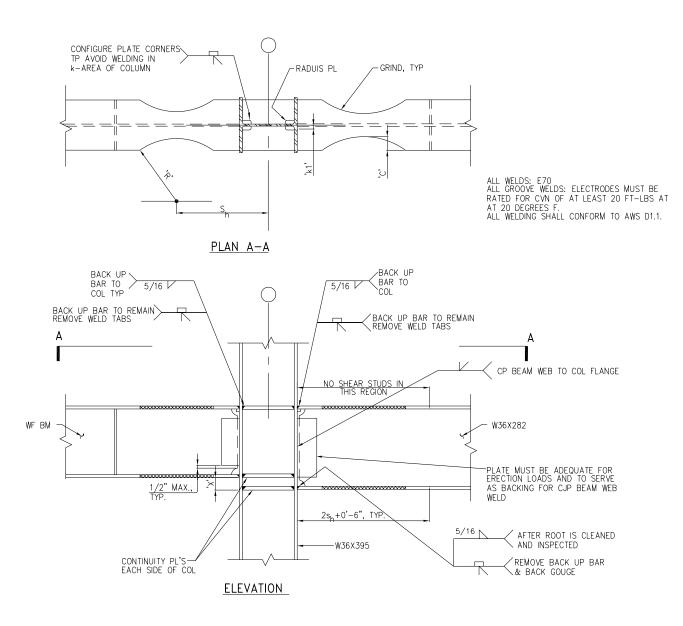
Schematic "General" Reduced Beam Section Connection Detail (No Doubler Plate Shown)
